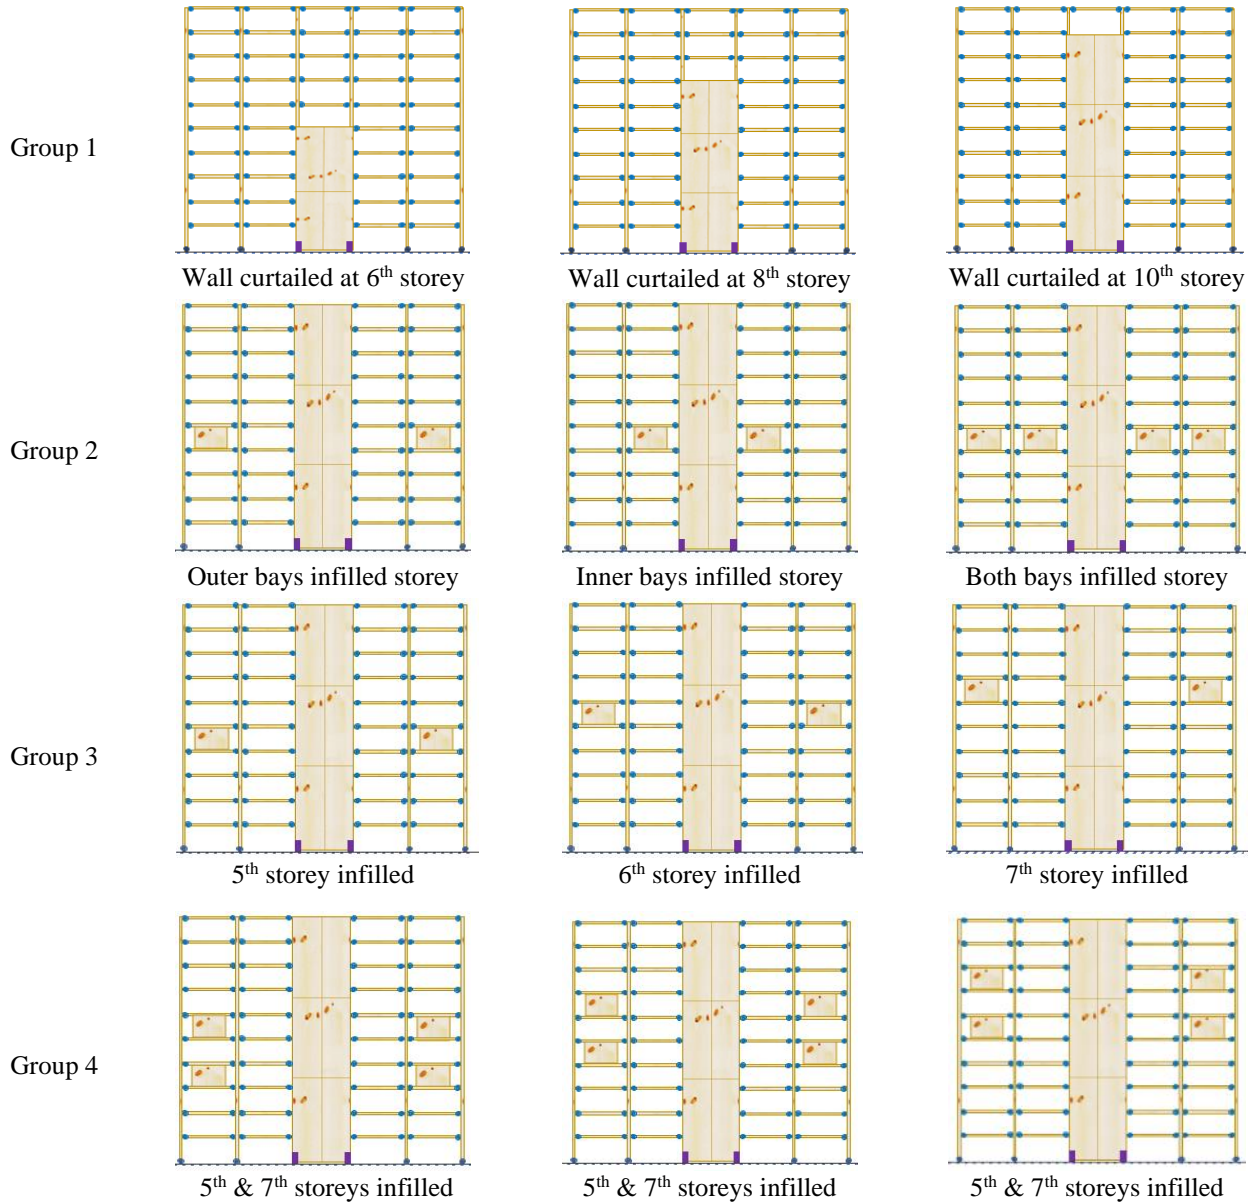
Case study buildings (Note: Some of the case study buildings are not presented in this figure).
